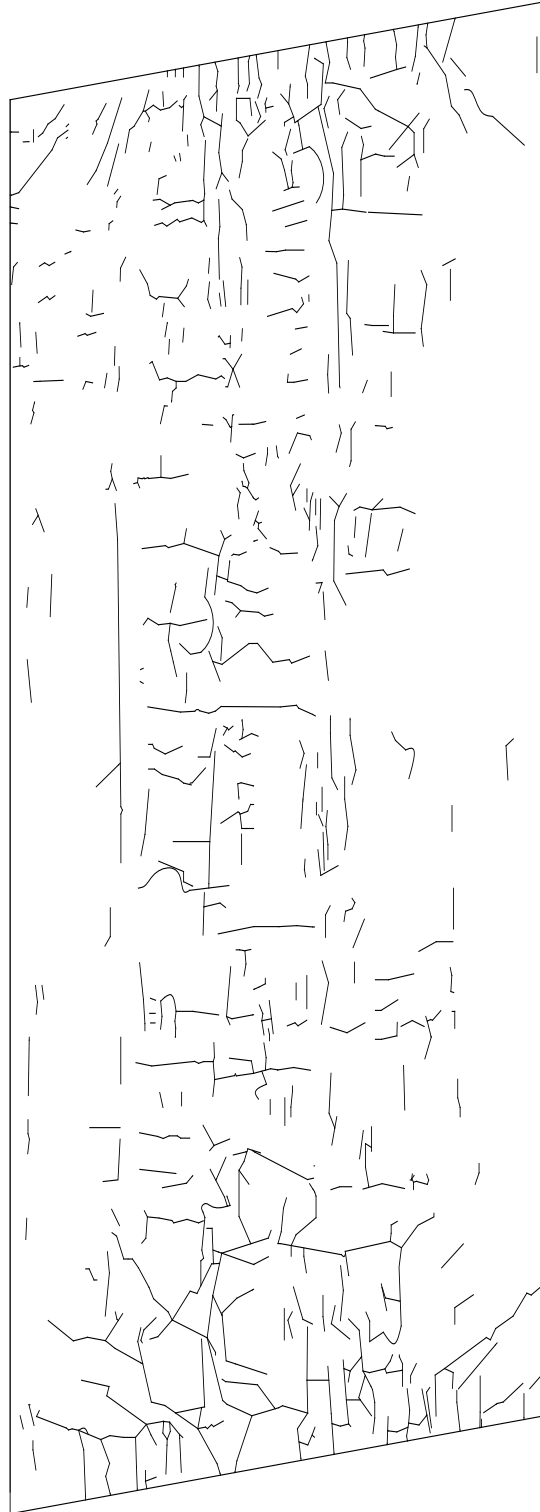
Concrete Slab Bridge Number LOR-83-1032 Crack Map
